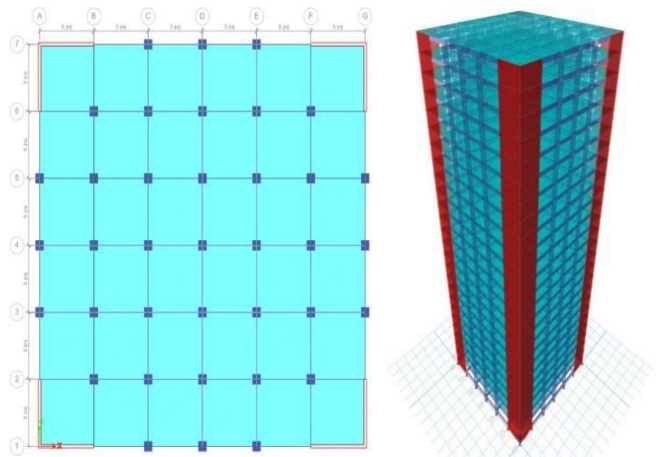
2D and 3D rendered view of sharp edge at the corners of building with shear wall
